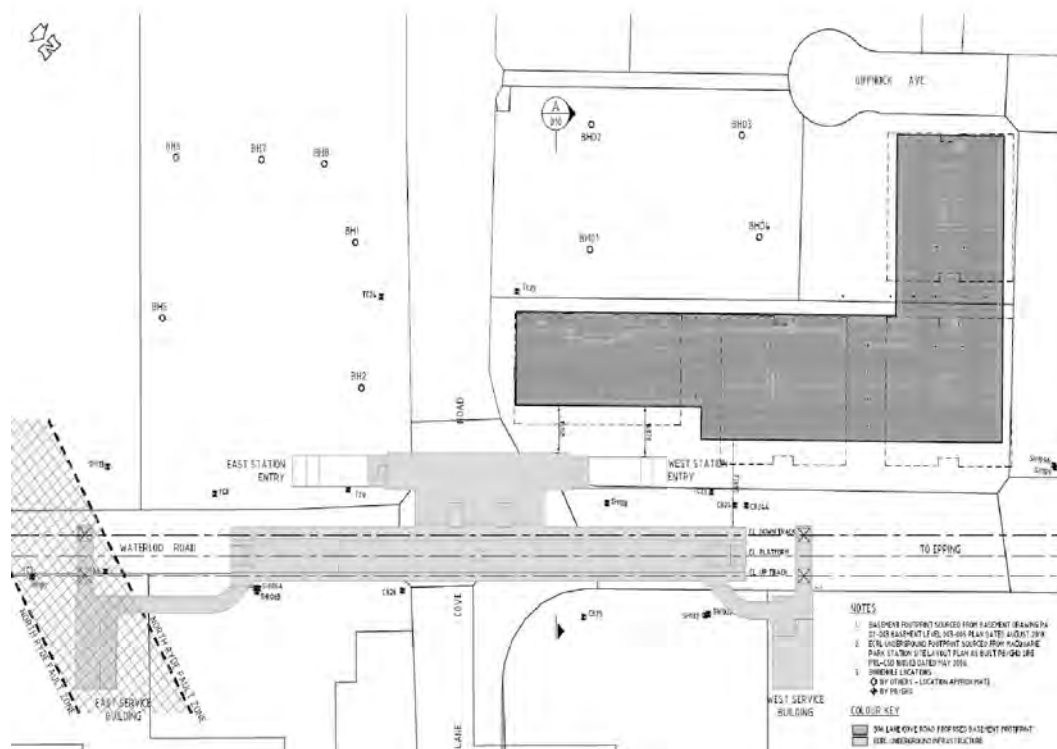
Site Plan showing the proposed basement and ECRL underground boundary
